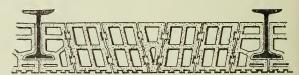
The Doulton-Peto Fireproof Floor.
